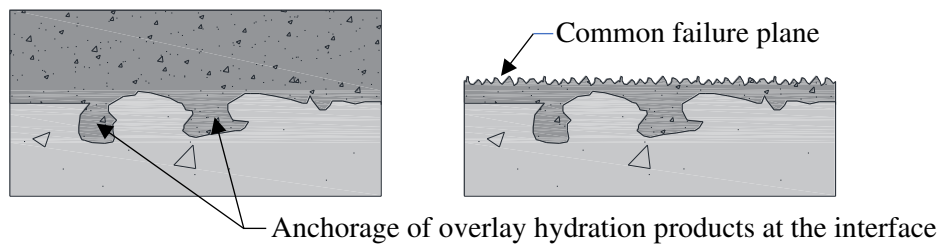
Common failure plane for concrete-to-concrete interfaces (adapted from [53]).
